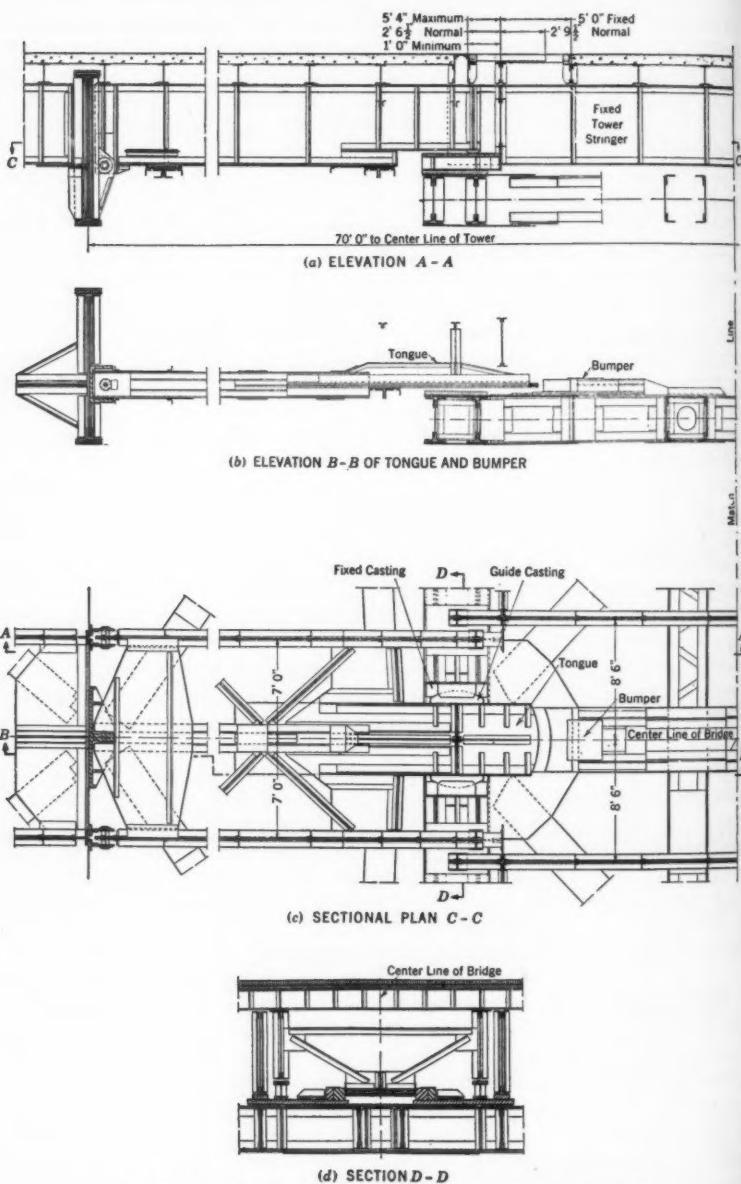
FLOOR EXPANSION DETAILS AT TOWER, CENTER SPAN.
